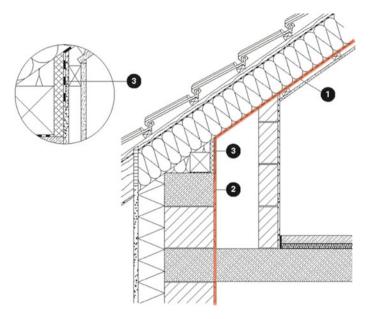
Wall/ceiling connection with a jamb: (1) air barrier, (2) interior plaster, (3) adhesive, tape, plaster base
